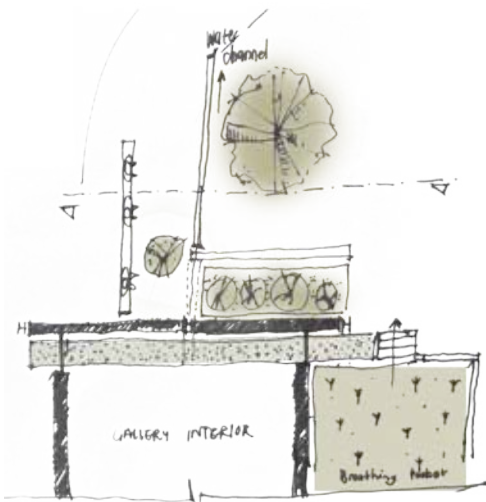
, 162, 163: Landscaping surrounding gallery edge and gutter detail
